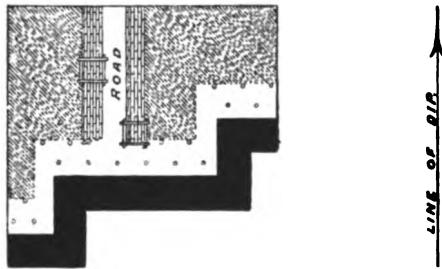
COWDENBEATH COLLIERIES, EAST SCOTLAND. PLAN SHOWING FACE OF LONGWALL WORKING IN THE DUNFERMLINE SPLINT COAL SEAM.
